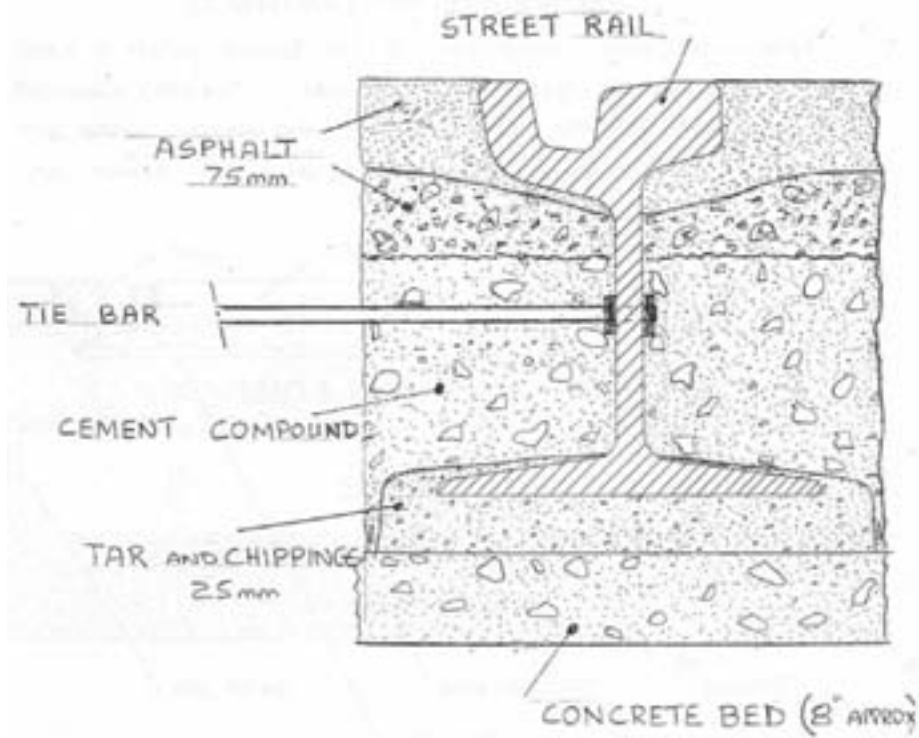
Schematic diagram of Blackpool and Fleetwood tramway grooved rail track construction as used for street running tracks and level crossings
